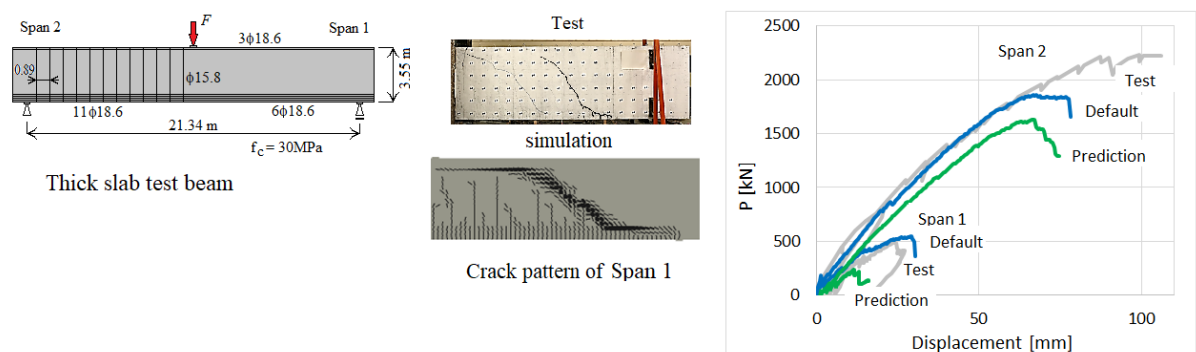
Shear strength of reinforced concrete foundation, Berkeley 2021.
